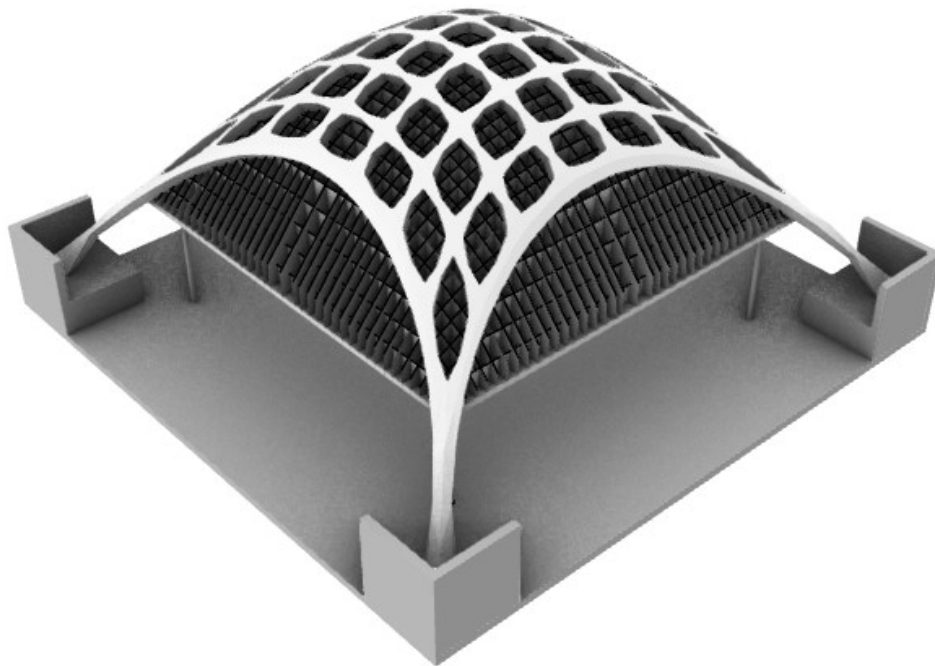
4th Step - Vault fabrication through the voussoirs assembly
